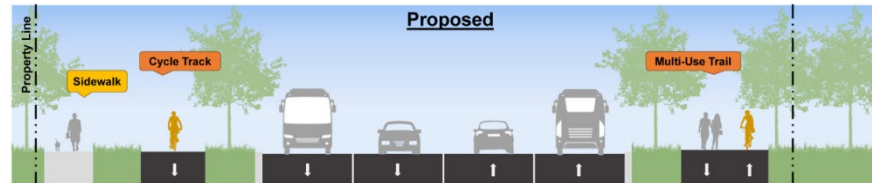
Illustration showing the multi-use trail conditions for the proposed changes on Bathurst Street between Sheppard Avenue West and Raoul Wallenberg Road.
